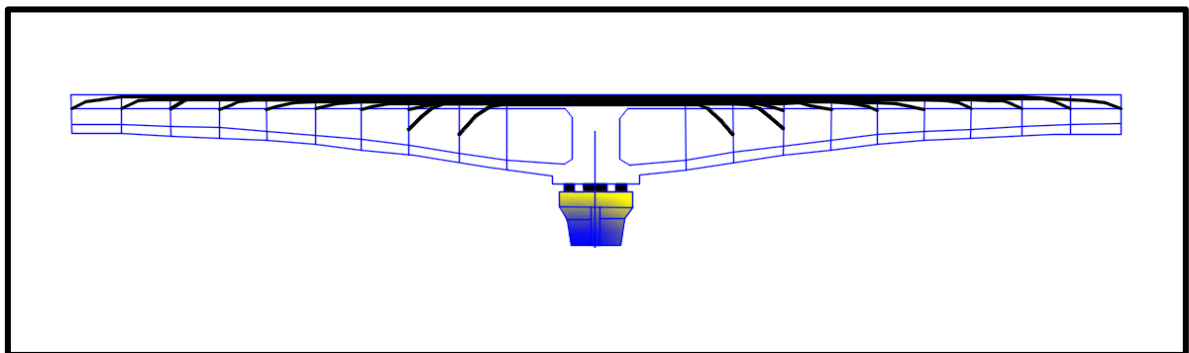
Design of Top Slab Continuity Tendons in Box-Girder Bridge
